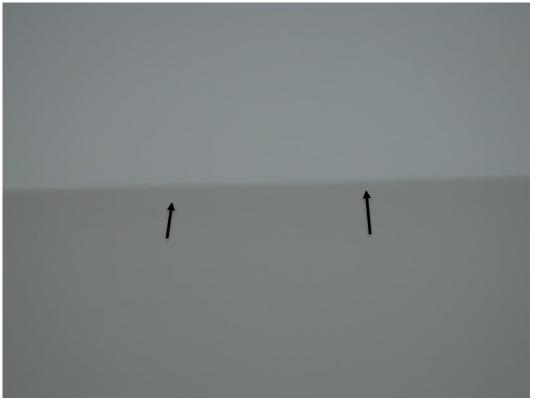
shows horizontal and radial cracking through the hallway arch.
